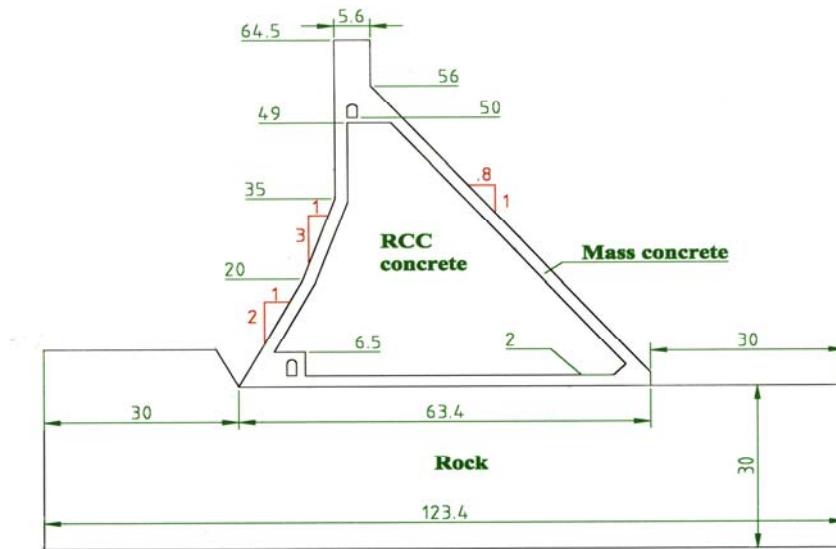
Section of the Zirdan Roller Compacted Concrete Dam.
